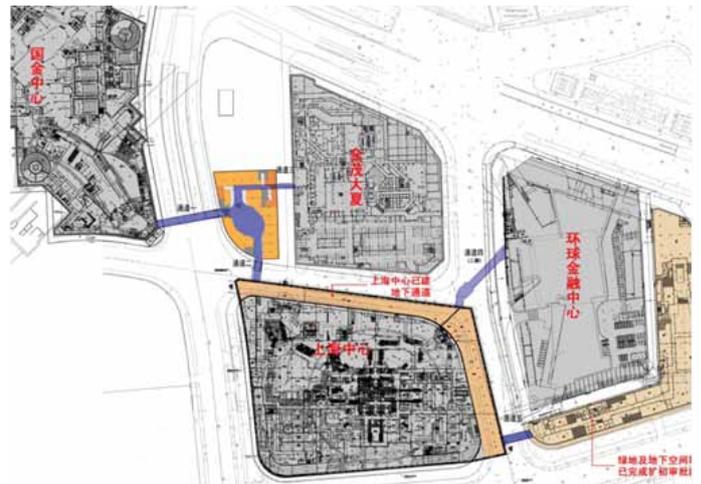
Underground passage layout (Source: Shanghai Tower Construction & Development Co., Ltd)
